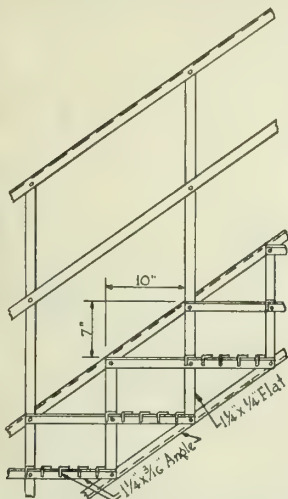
DETAILS OF CONSTRUCTION FOR "MACIRON" STEEL STAIRS.
